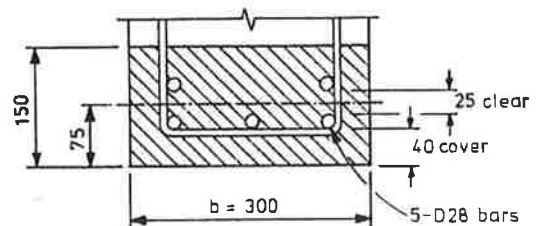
CALCULATION OF EFFECTIVE AREA OF CONCRETE IN TENSION
